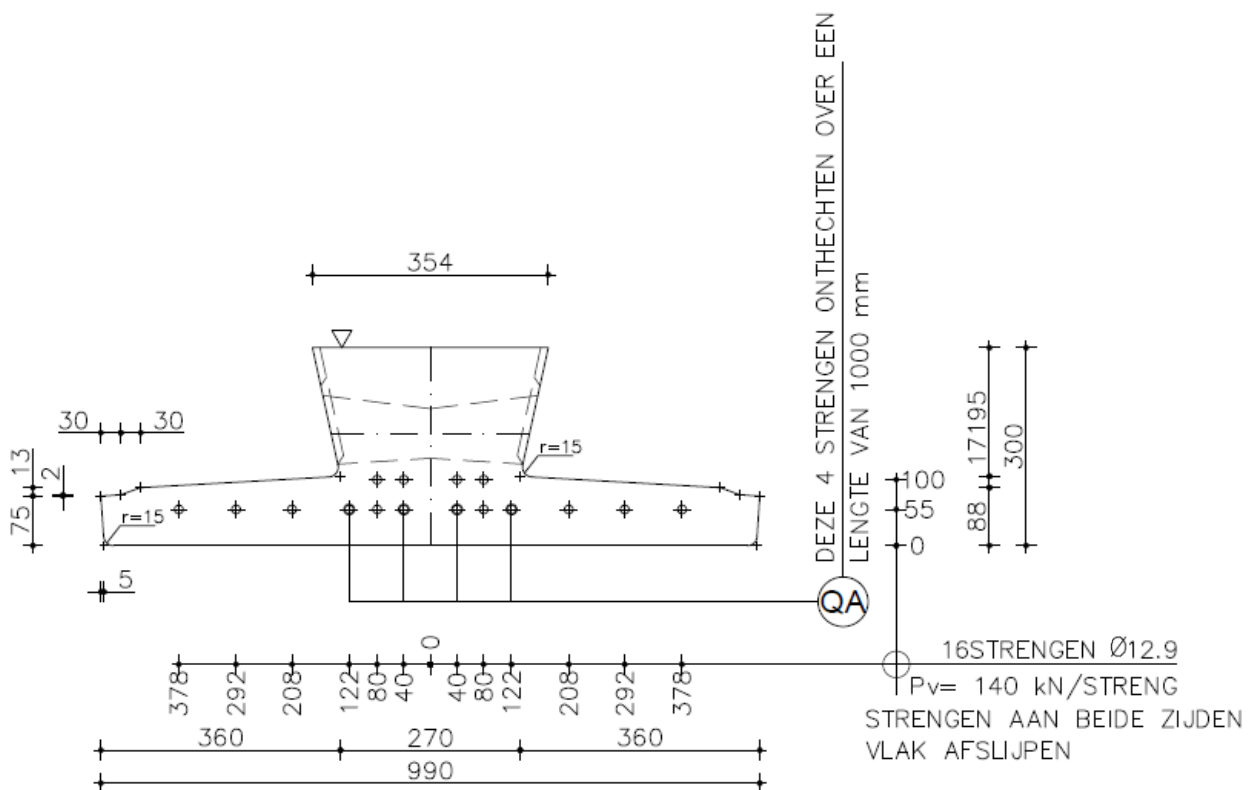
Schematic cross section and prestressing layout of an HKO-300 prestressed geopolymer concrete girder
